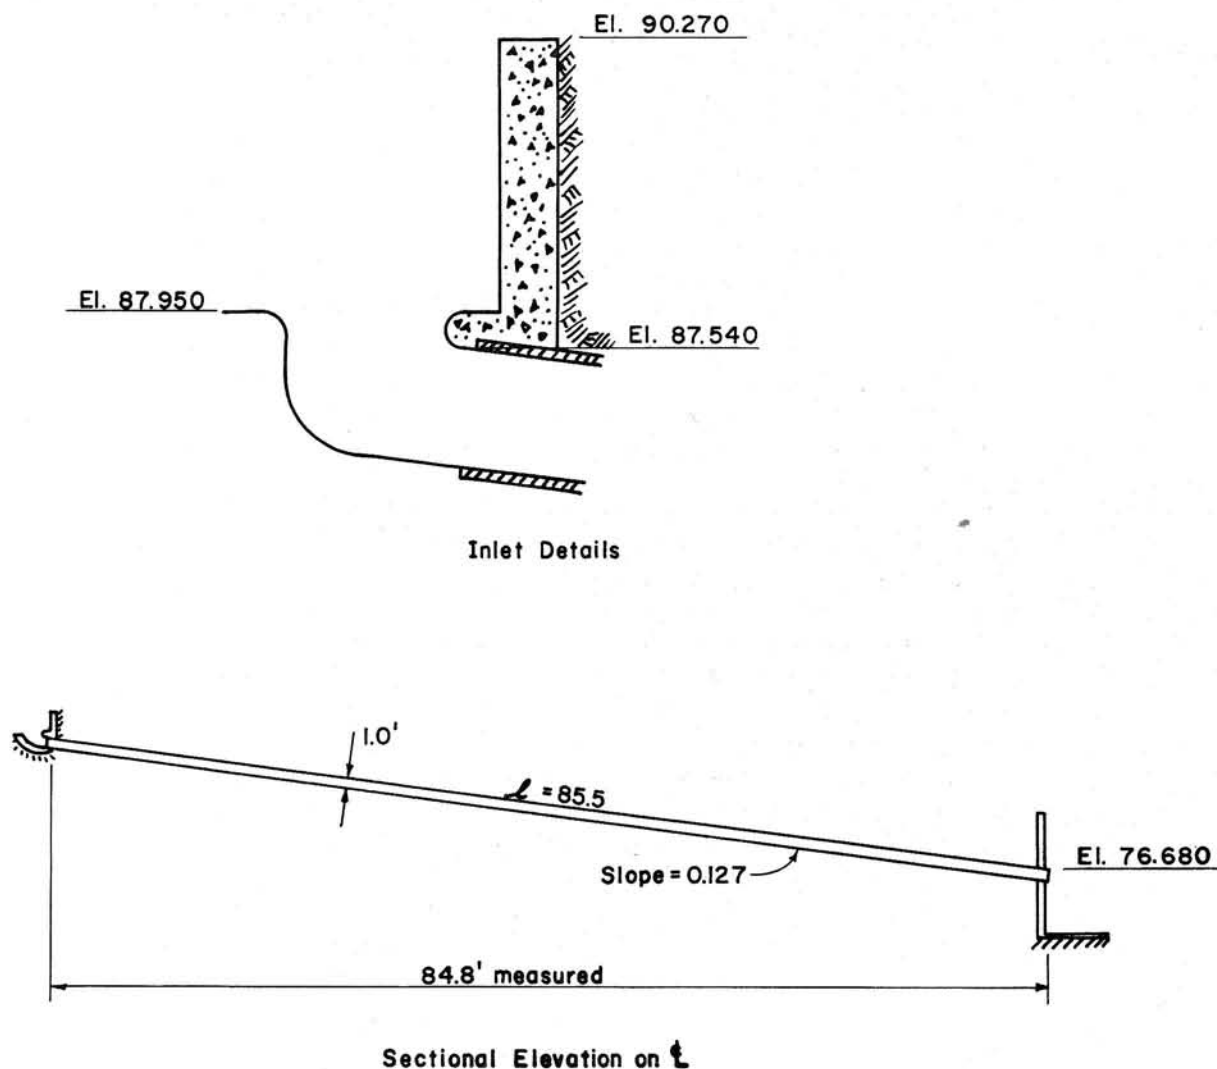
Bethany, Missouri, Closed Conduit Spillway.
